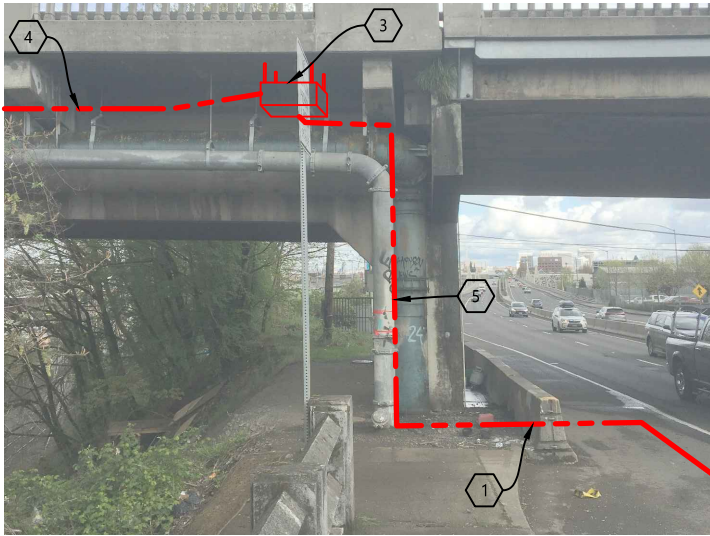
FACING NORTH ON SOUTH SIDE OF BRIDGE, EAST SIDE OF WILLAMETTE RIVER
